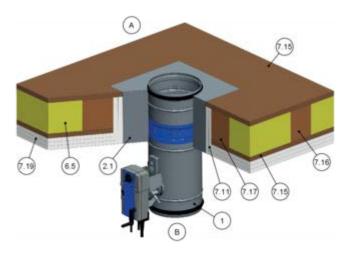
Mortar-based installation into wooden beam or gluelam ceiling, upright (illustration is an example; other ceiling constructions upon request)
